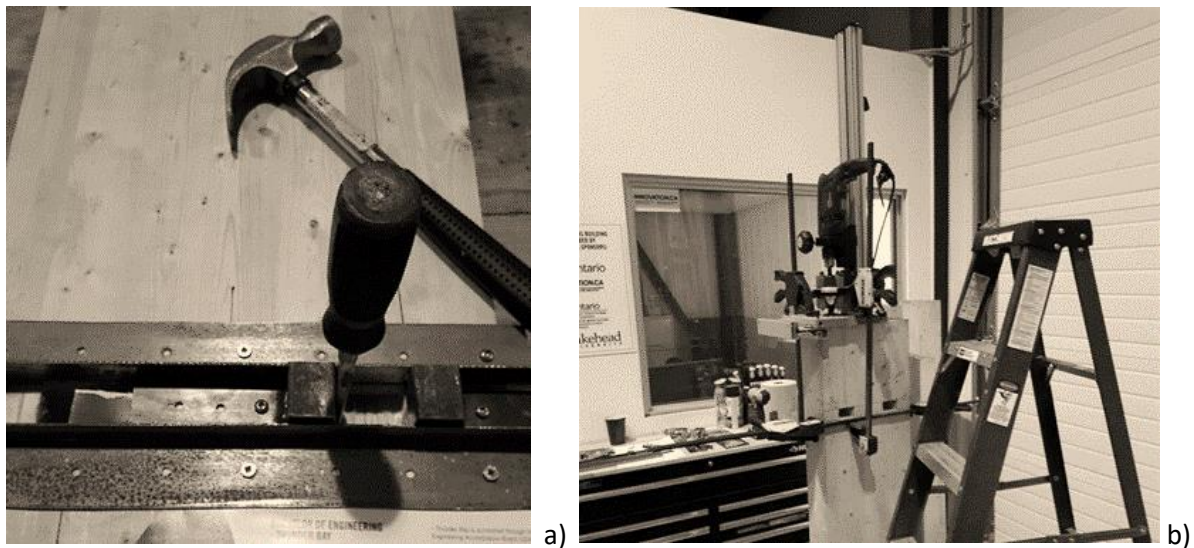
a) A beam section being chiselled; b) A beam section being drilled
